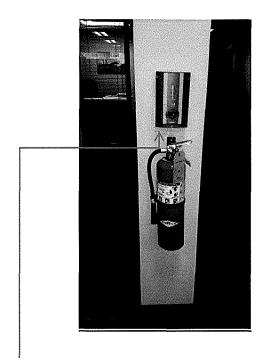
1301 Canal; stand-alone methane detector, column K5.
